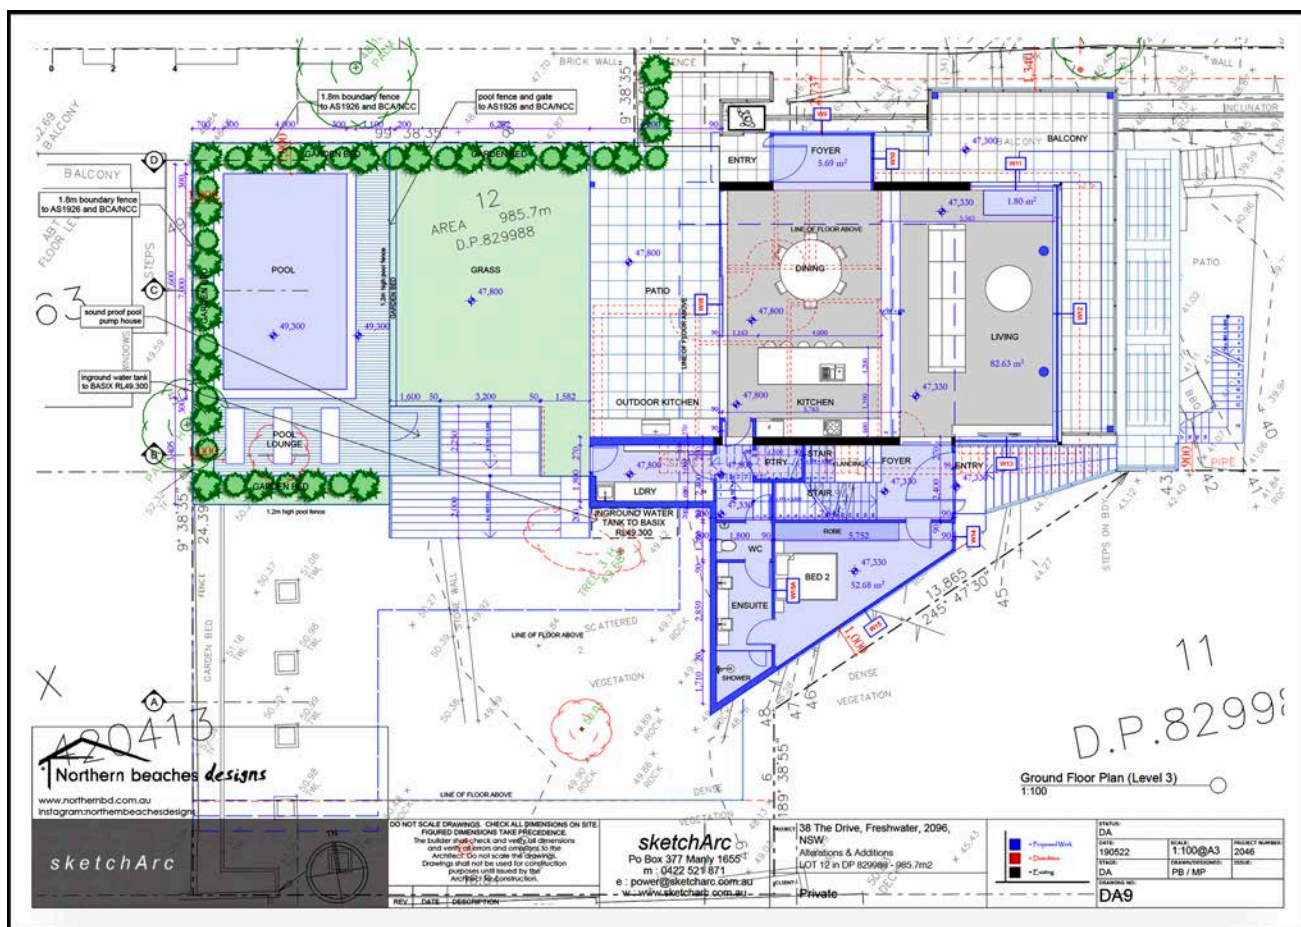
Drawing from SketchArc: Ground Floor Plan – Level 3.
